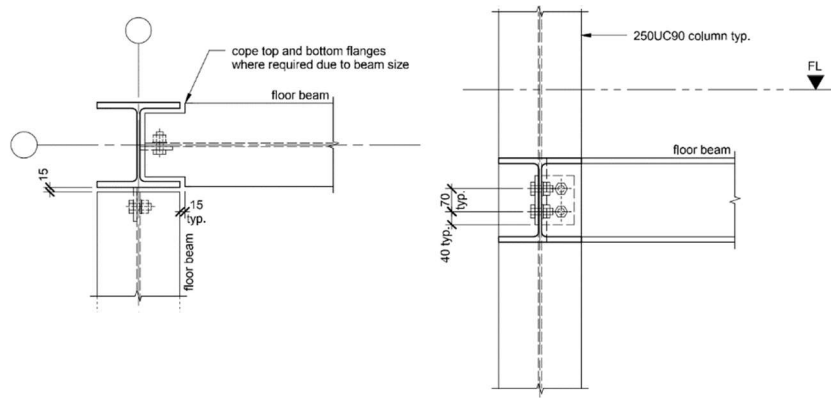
Typical beam-column joint at (a) roof level and (b) typical floor
